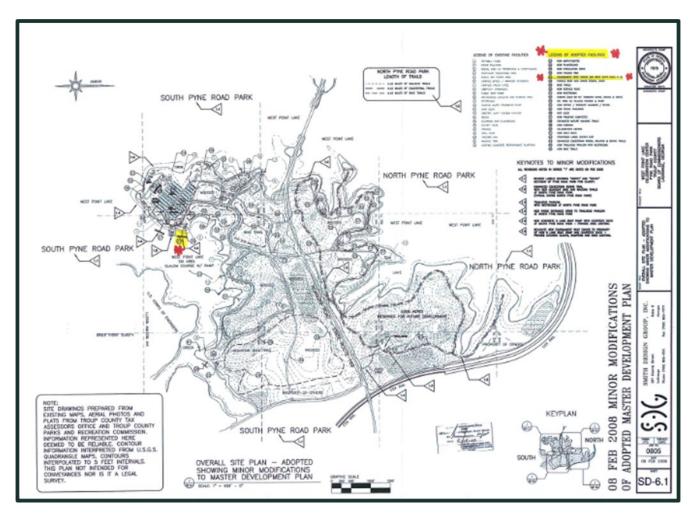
Existing Master Plan Troup County Pyne Road Park
